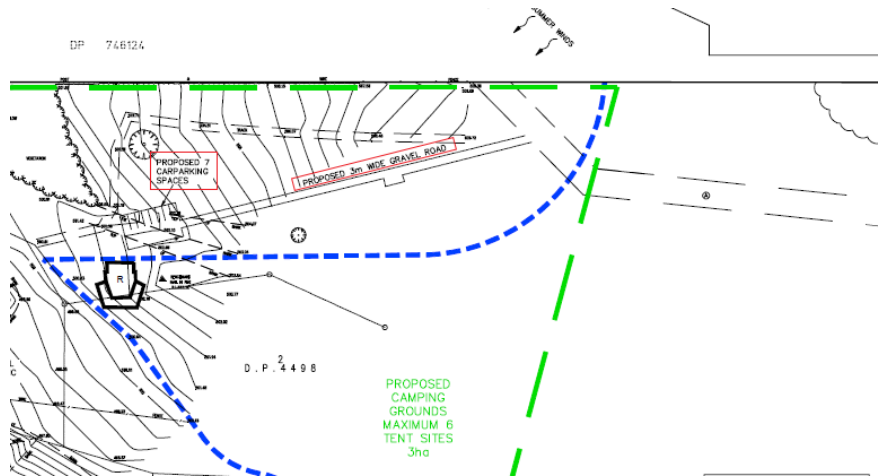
Extract of the Site Plan showing the location of the proposed access track and onsite parking
